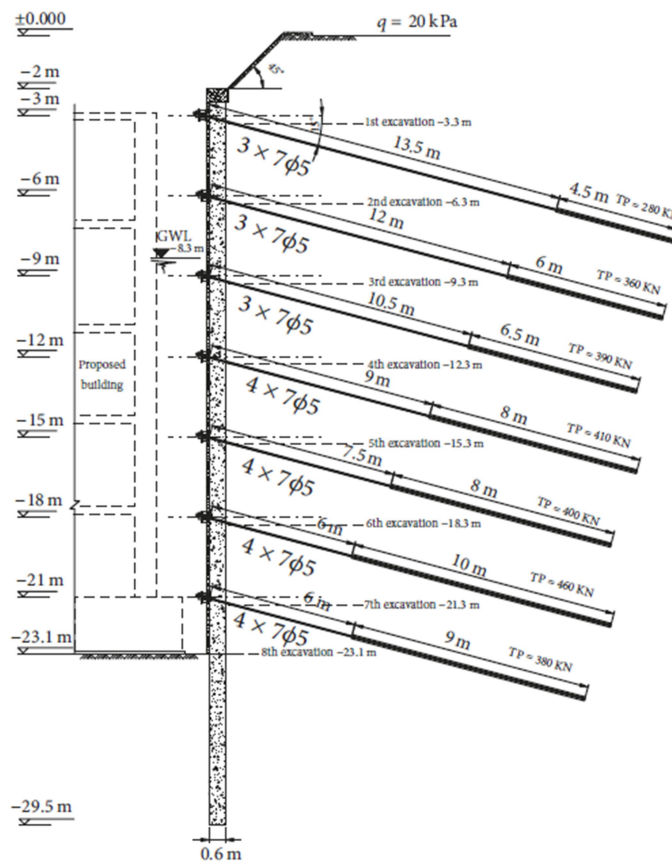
Cross Section Profile of Retaining Wall in China (Han, Zhao, Chen, Jia and Guan 2017 [14])
